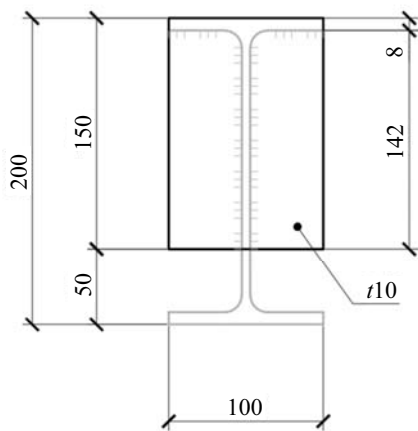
Dimensions of the support rib welded to the beam
